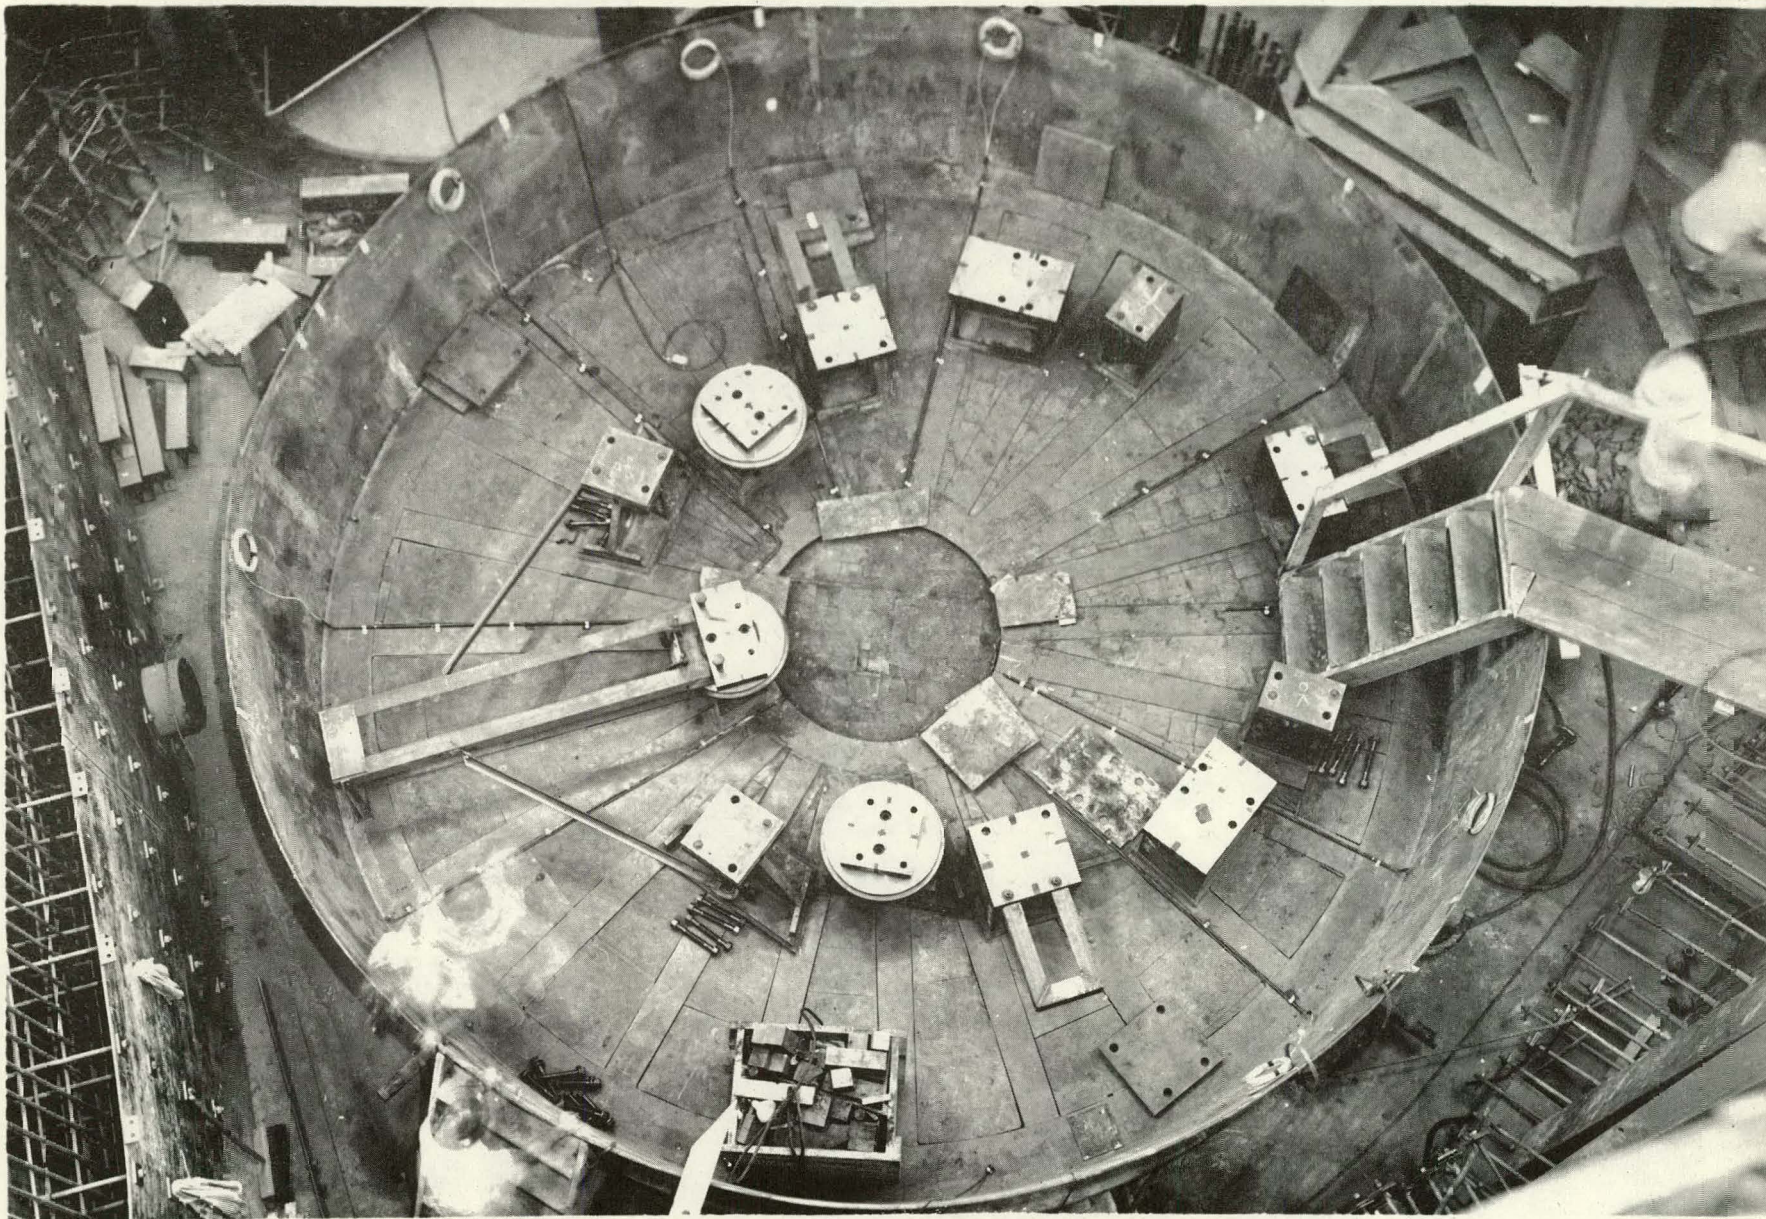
LOWER SECTION OF PRIMARY SHIELD TANK
